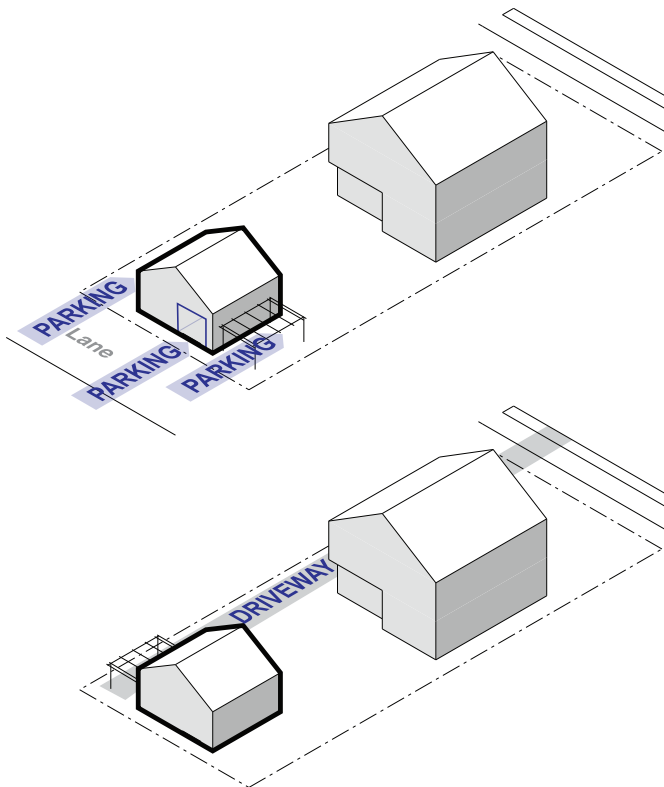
Parking should be provide in a surface space or in an enclosed garage in the coach house provided at least 30% of the gross floor area is located on the ground floor.
